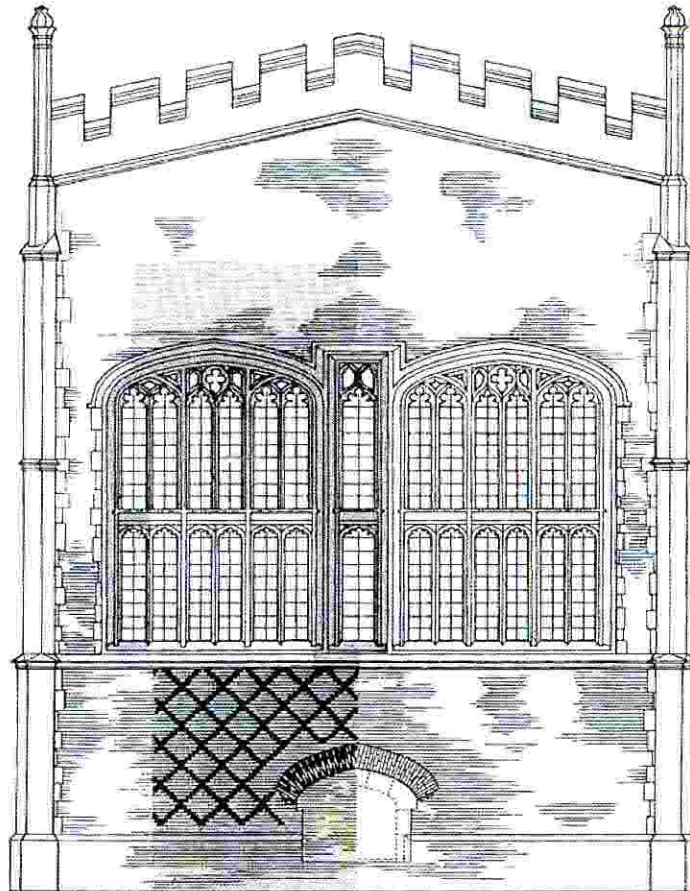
Chapel Court, North Facing Elevation - The probable Tudor diaperwork design as seen beside the Chapel east window (drawing: Daphne Ford)
